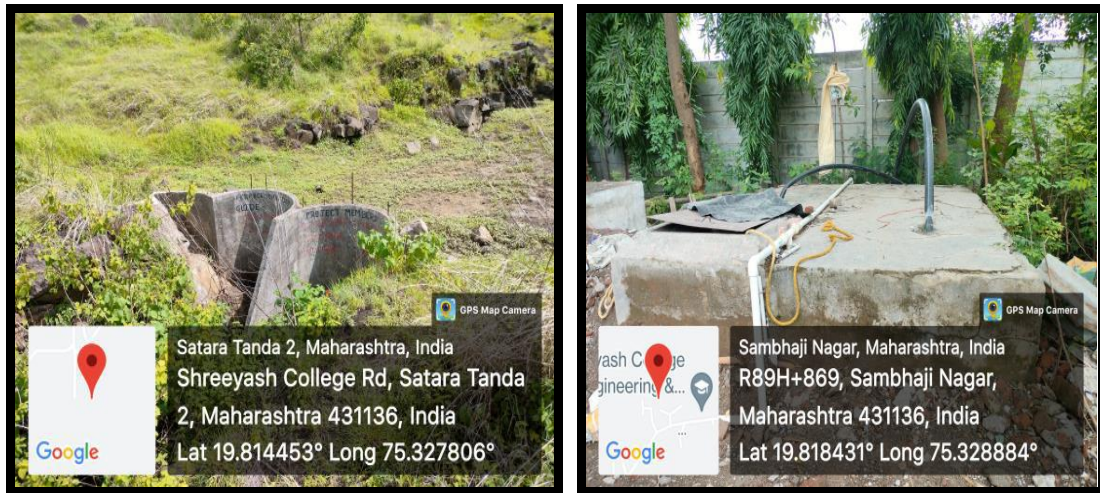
Construction of Water tanks in Engineering and Hostel Building.
